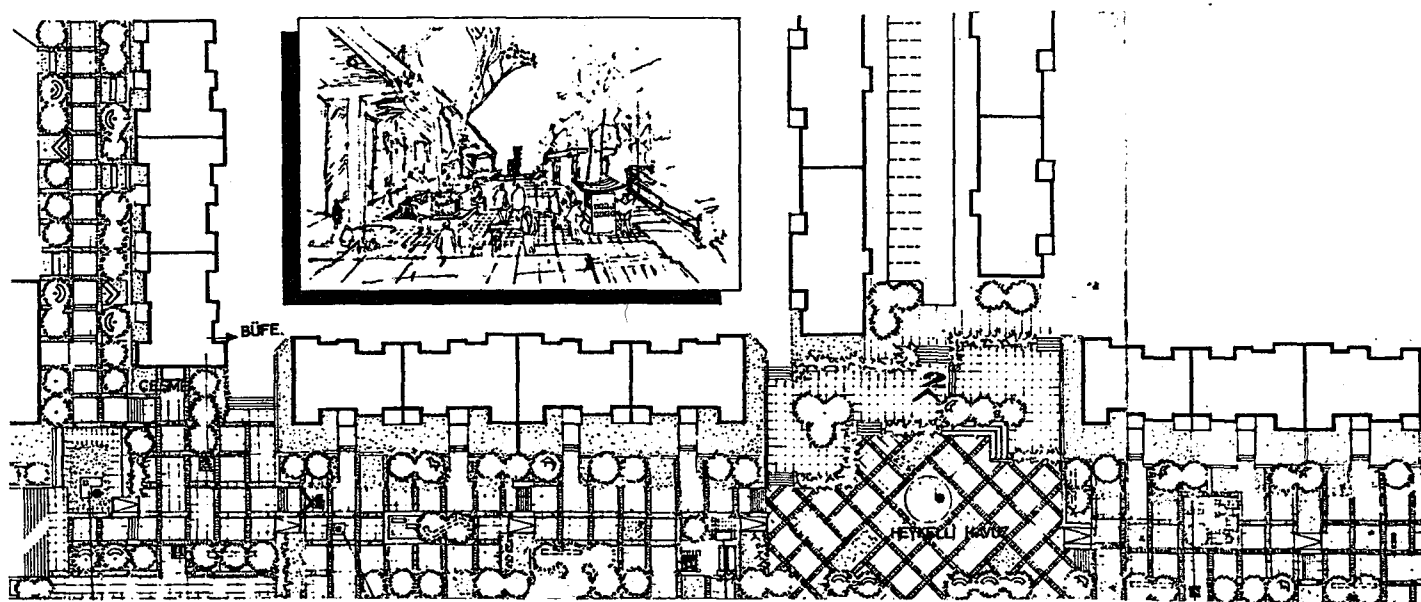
Site Plan, Yeni Batı (Source: KENT-KOOP 1986)
